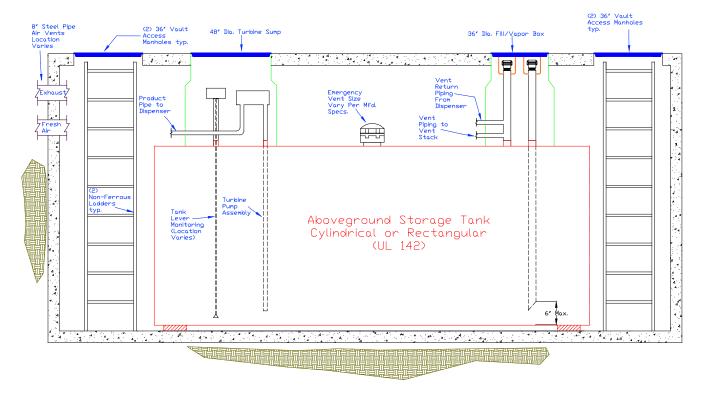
Front Sectional Views of Typical Vaulted AST
